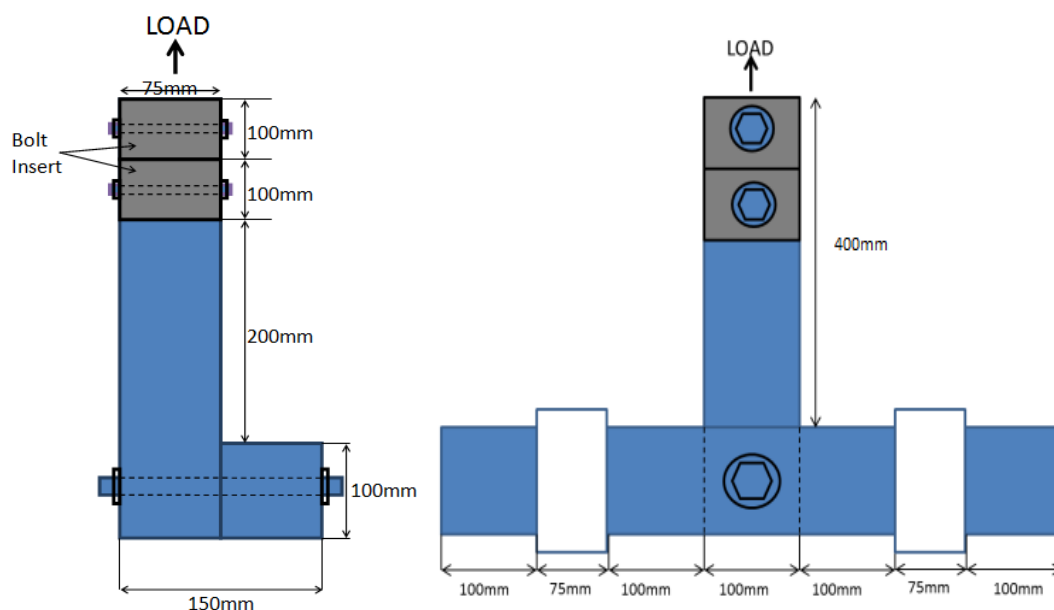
Geometrical configuration of pultruded GFRP T-joint
